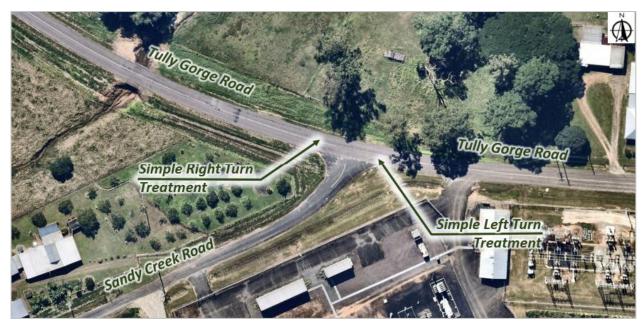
Existing Tully Gorge Road / Sandy Creek Road Turn Lane Arrangements
